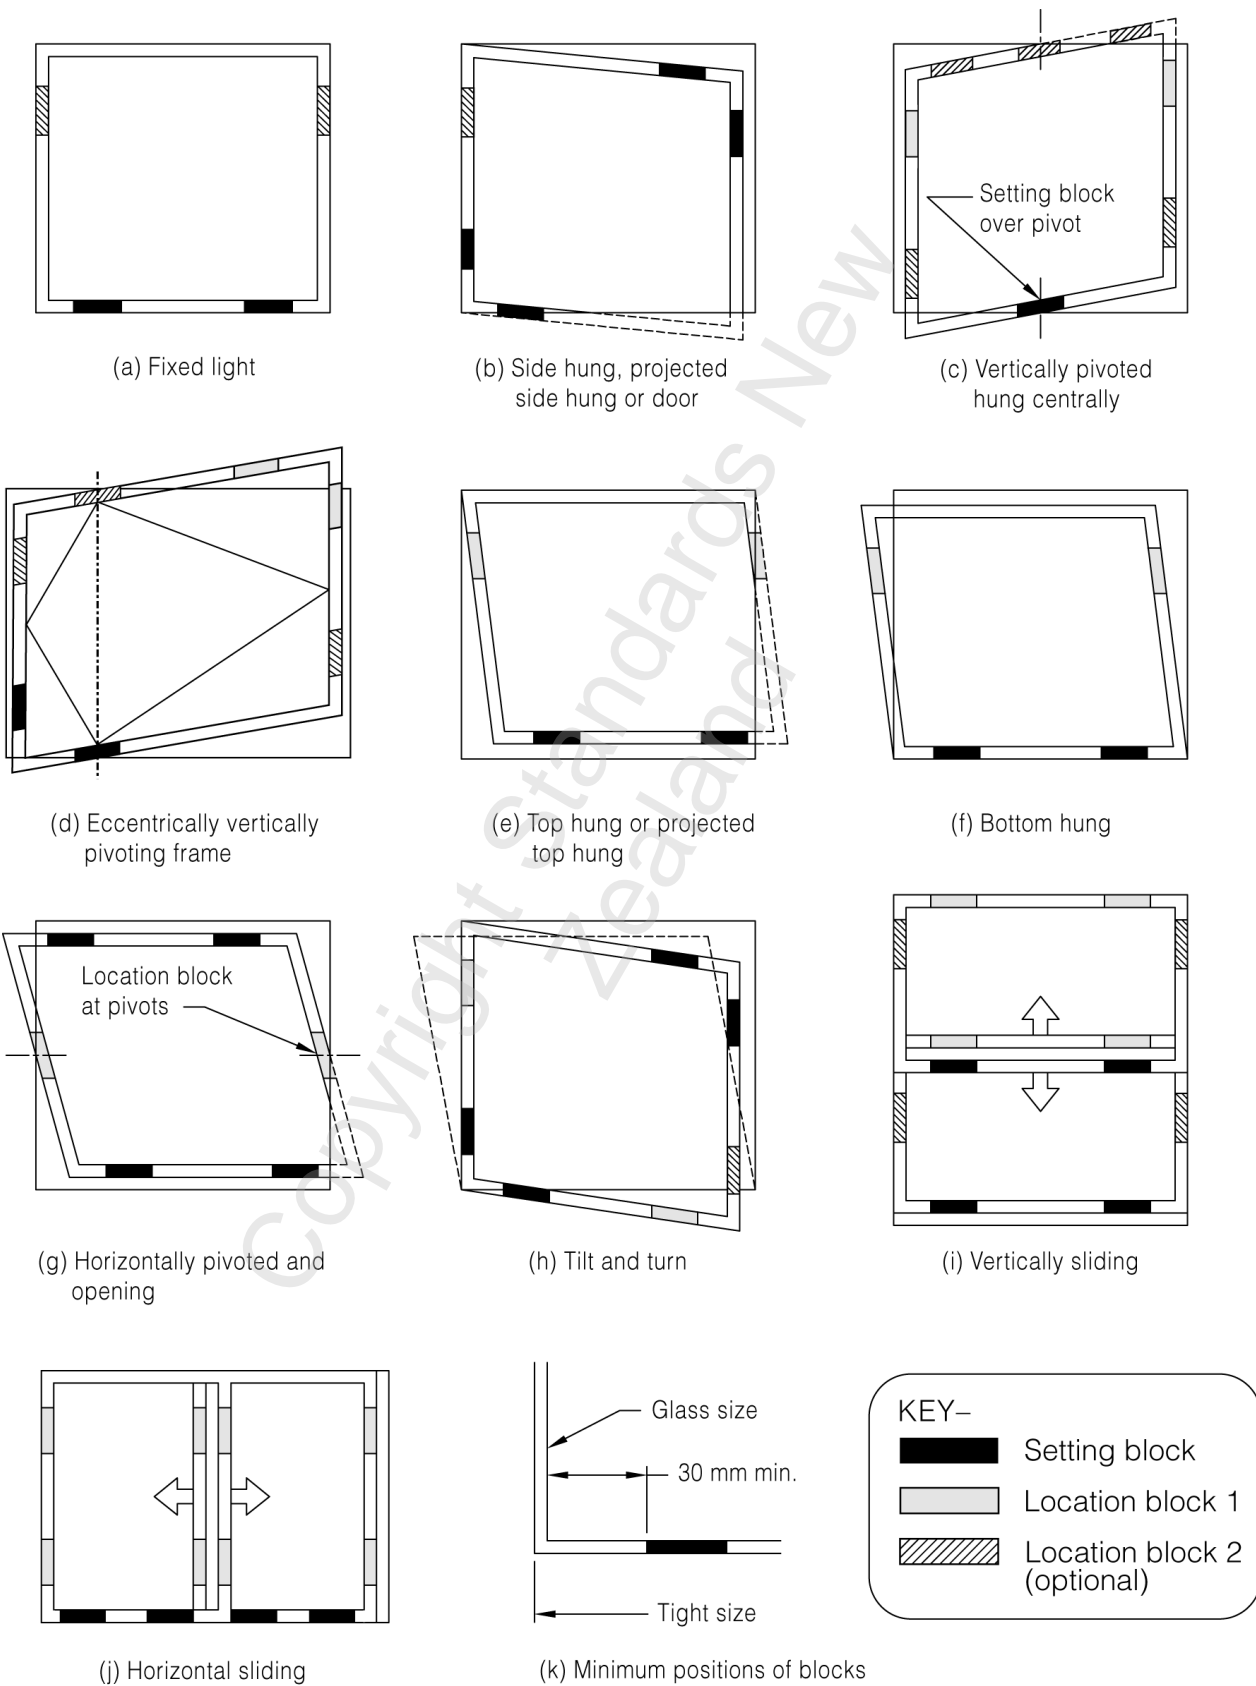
Recommended positions of setting and location blocks for the glazing of typical doors and windows
